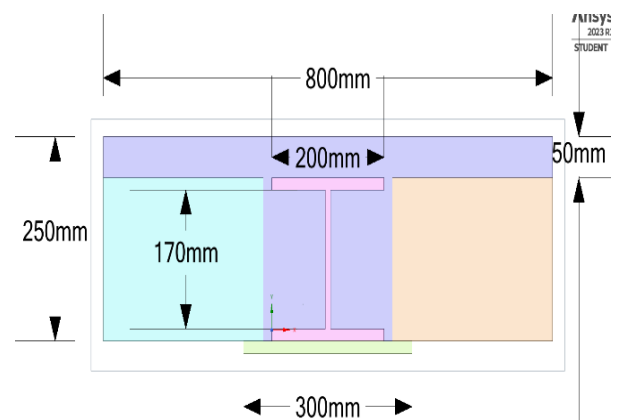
Dimensions of Slim Floor Beam with Hollow Core Slabs
